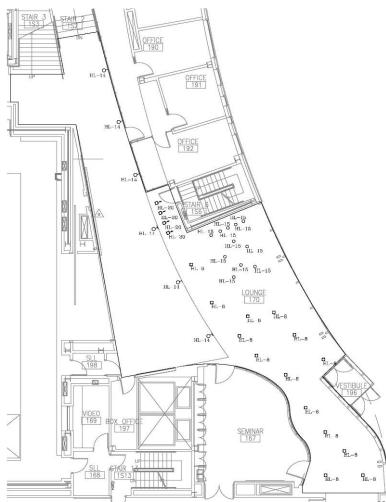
Reflected Ceiling Plan (reference appendix for luminaire types)
